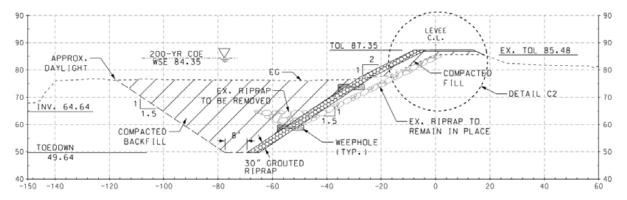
Typical Cross Section of Alternative 3, Grouted Riprap for 200-Year Flow (Sta. 270+00)
